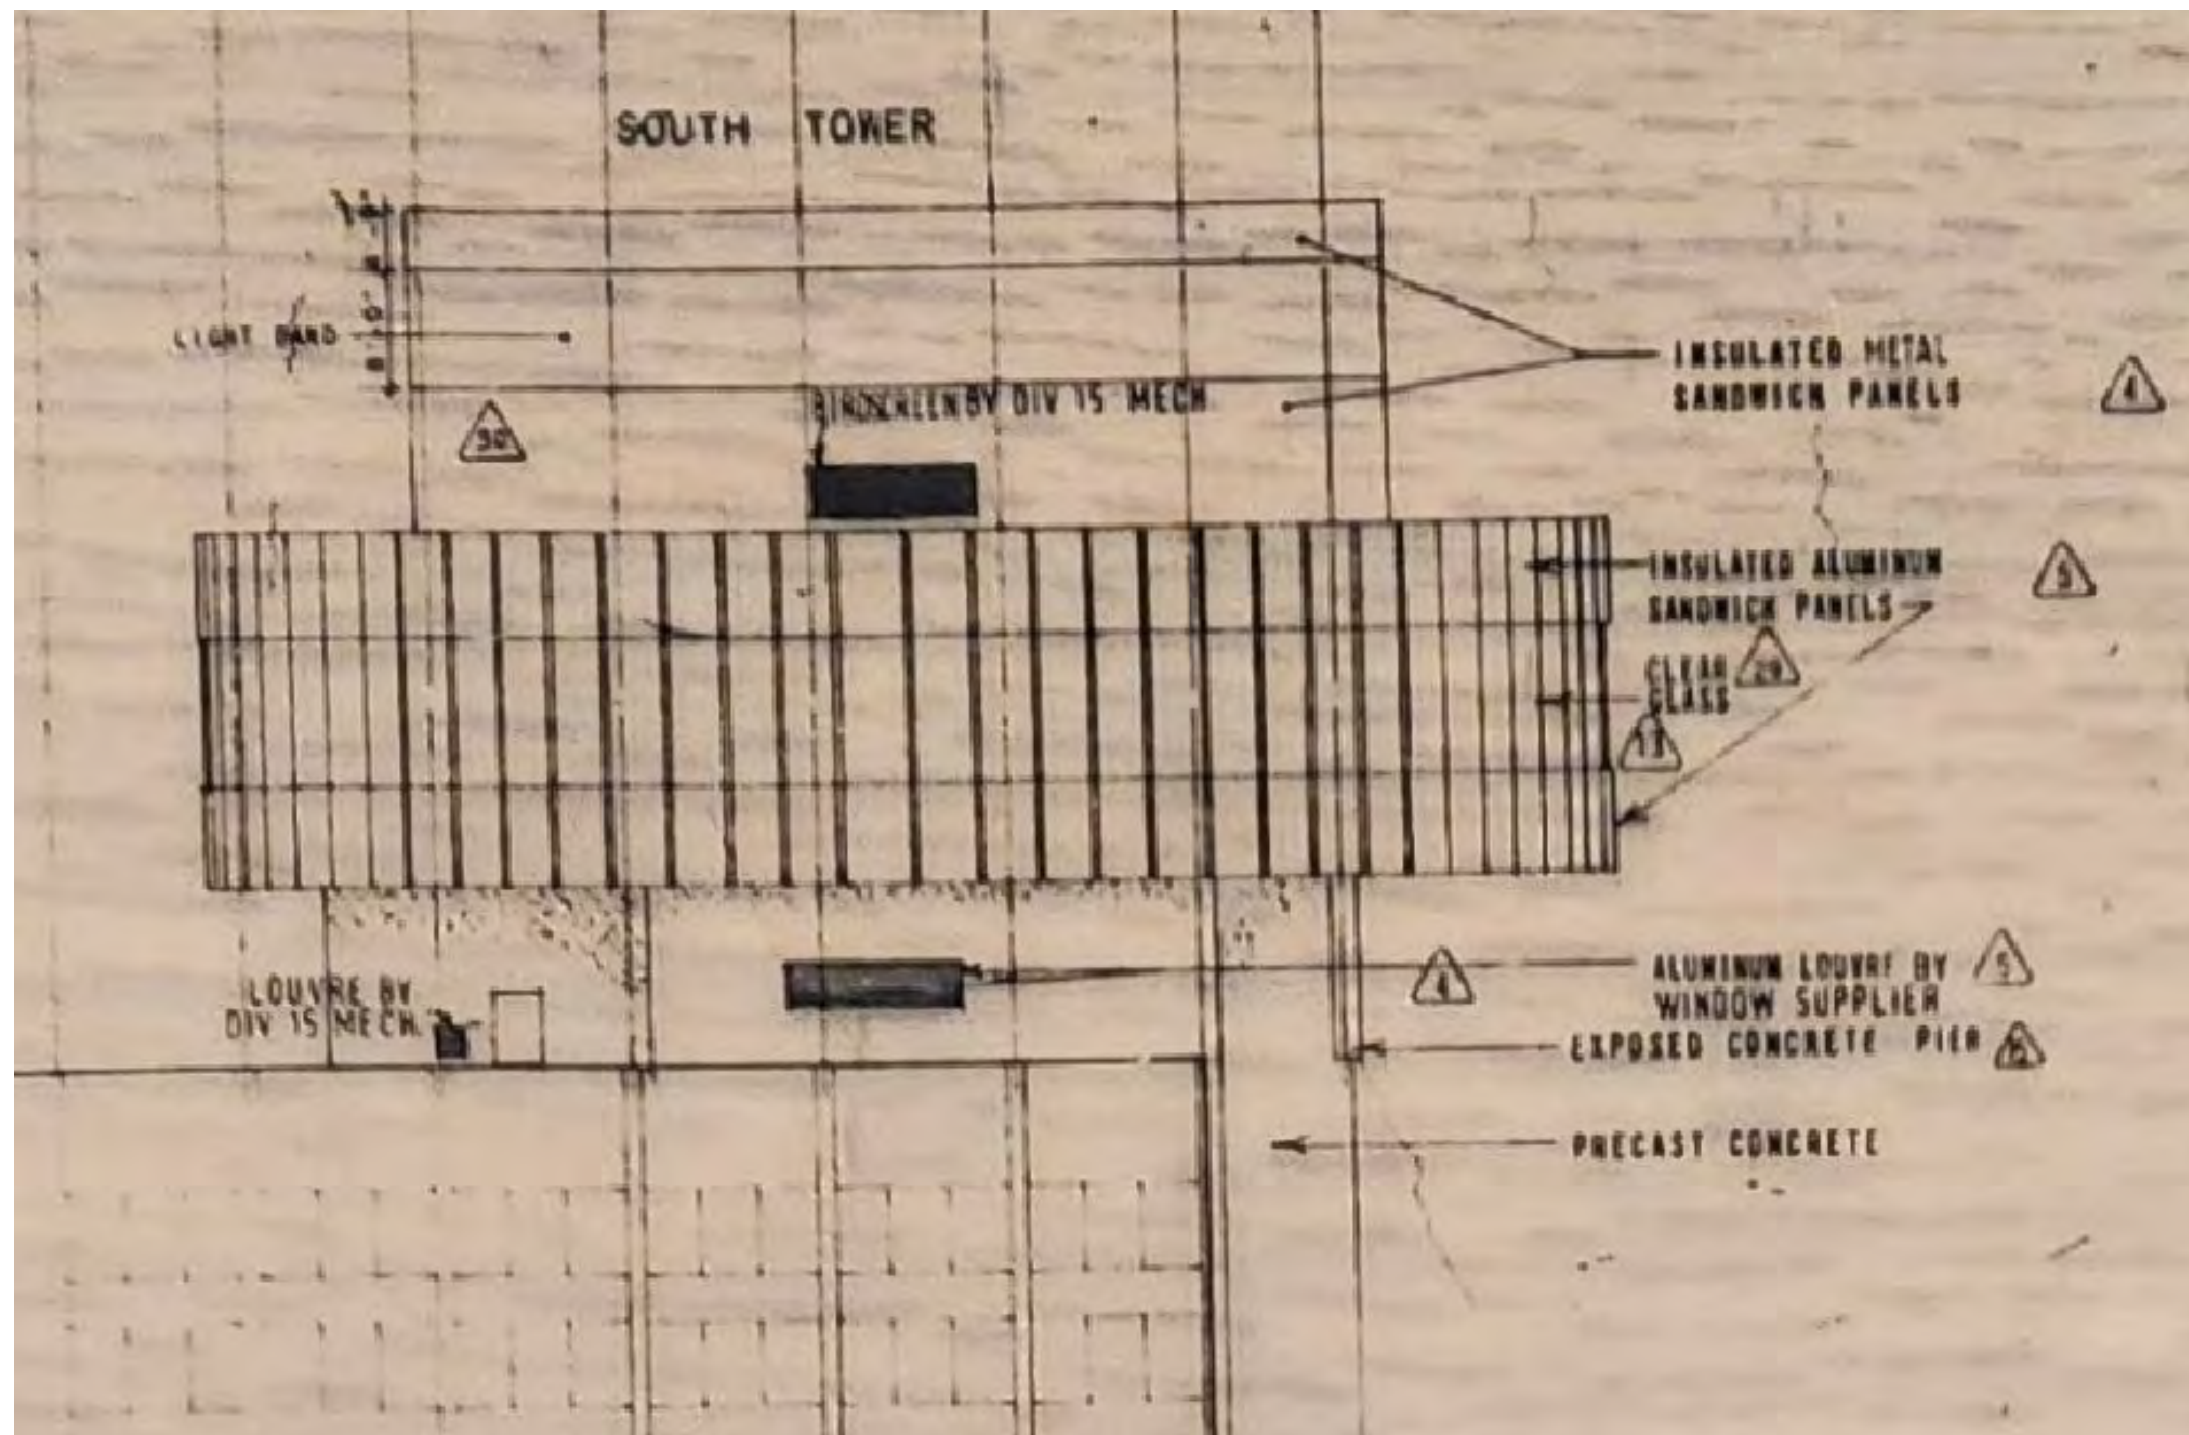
Detail of drawing showing east elevation of restaurant on top of south tower, 1973 (Campeau Corporation).
